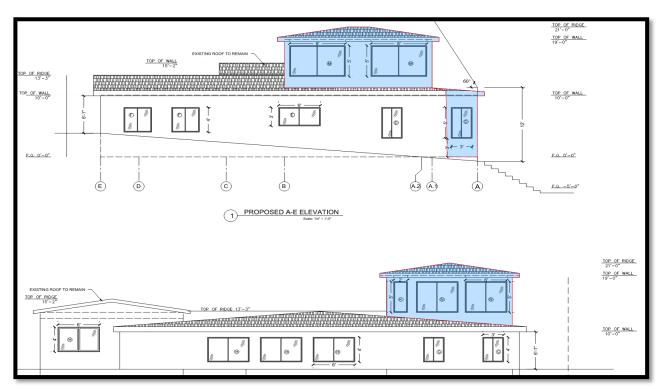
East (Top) and Rear (Bottom) elevation plan of the proposed development with first and second story additions.
